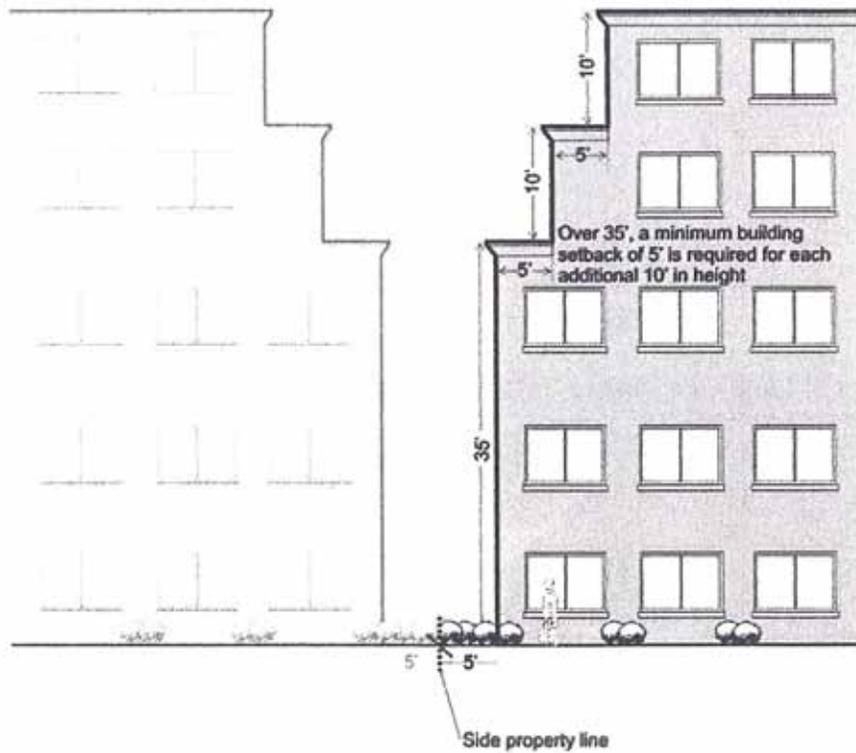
Additional side yard standards where buildings exceed thirty-five feet in height.
